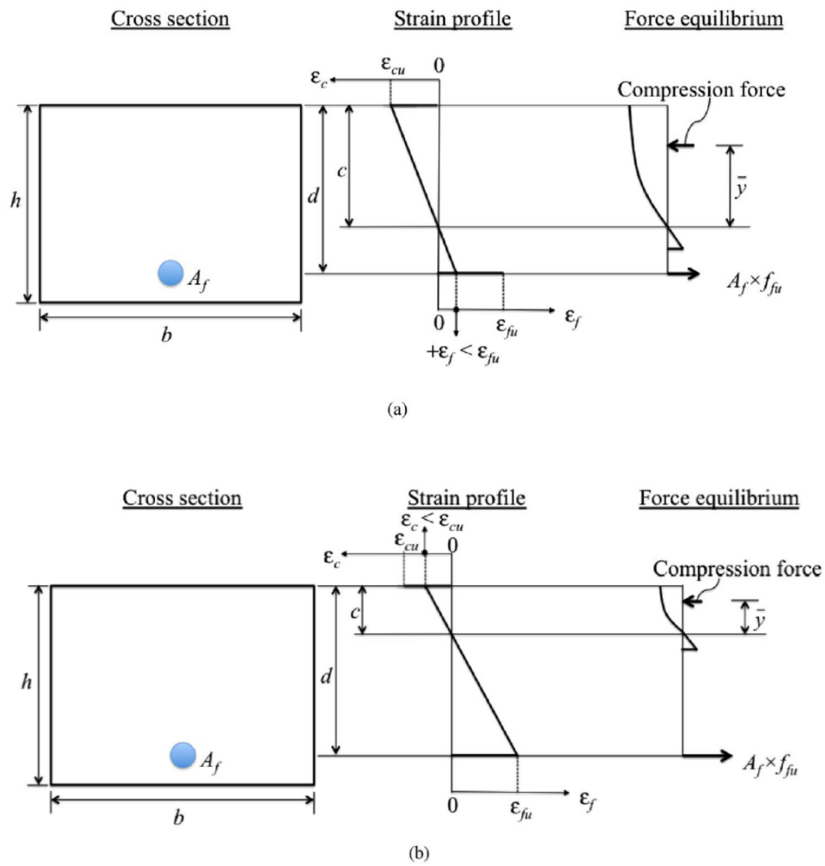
Failure modes of GFRP-reinforced bridge deck: (a) concrete crushing failure; and (b) GFRP bar failure (Kim et al., 2012).
